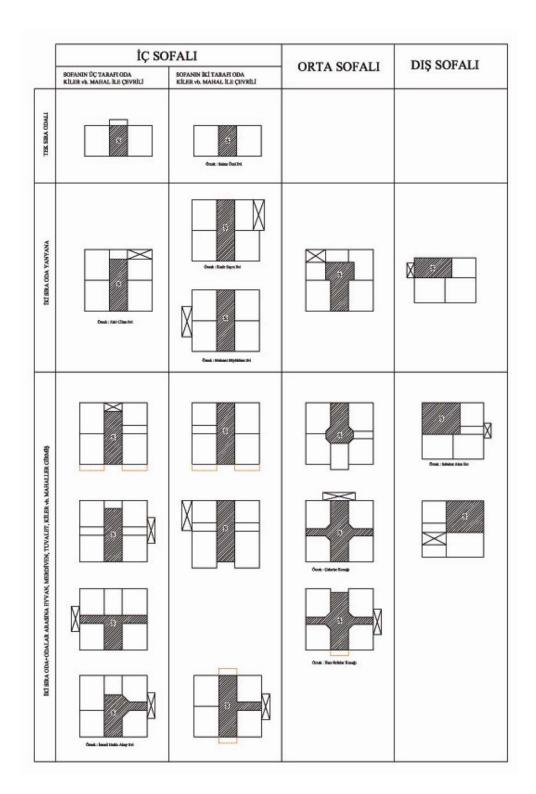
Plan typology of Taraklı houses (as cited in Özkan, 2008, p.51)
